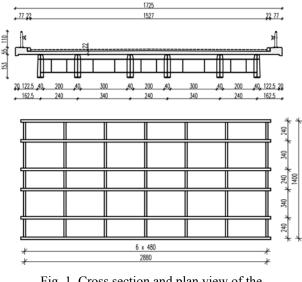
Cross section and plan view of the D(Mo)010 bridge
